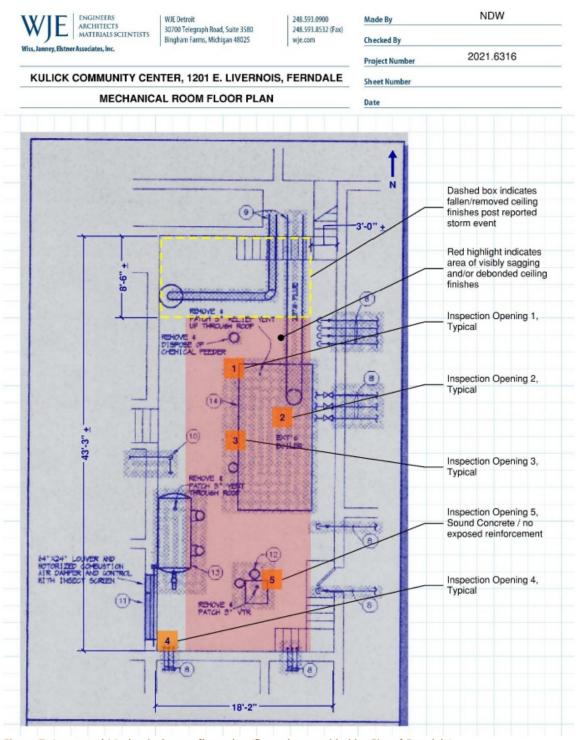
Annotated Mechanical room floor plan (floor plan provided by City of Ferndale)
